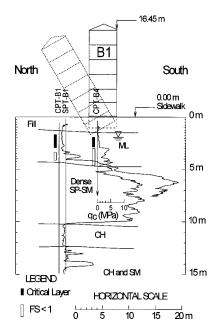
Soil profile at Site B where a tall slender building failed in bearing
